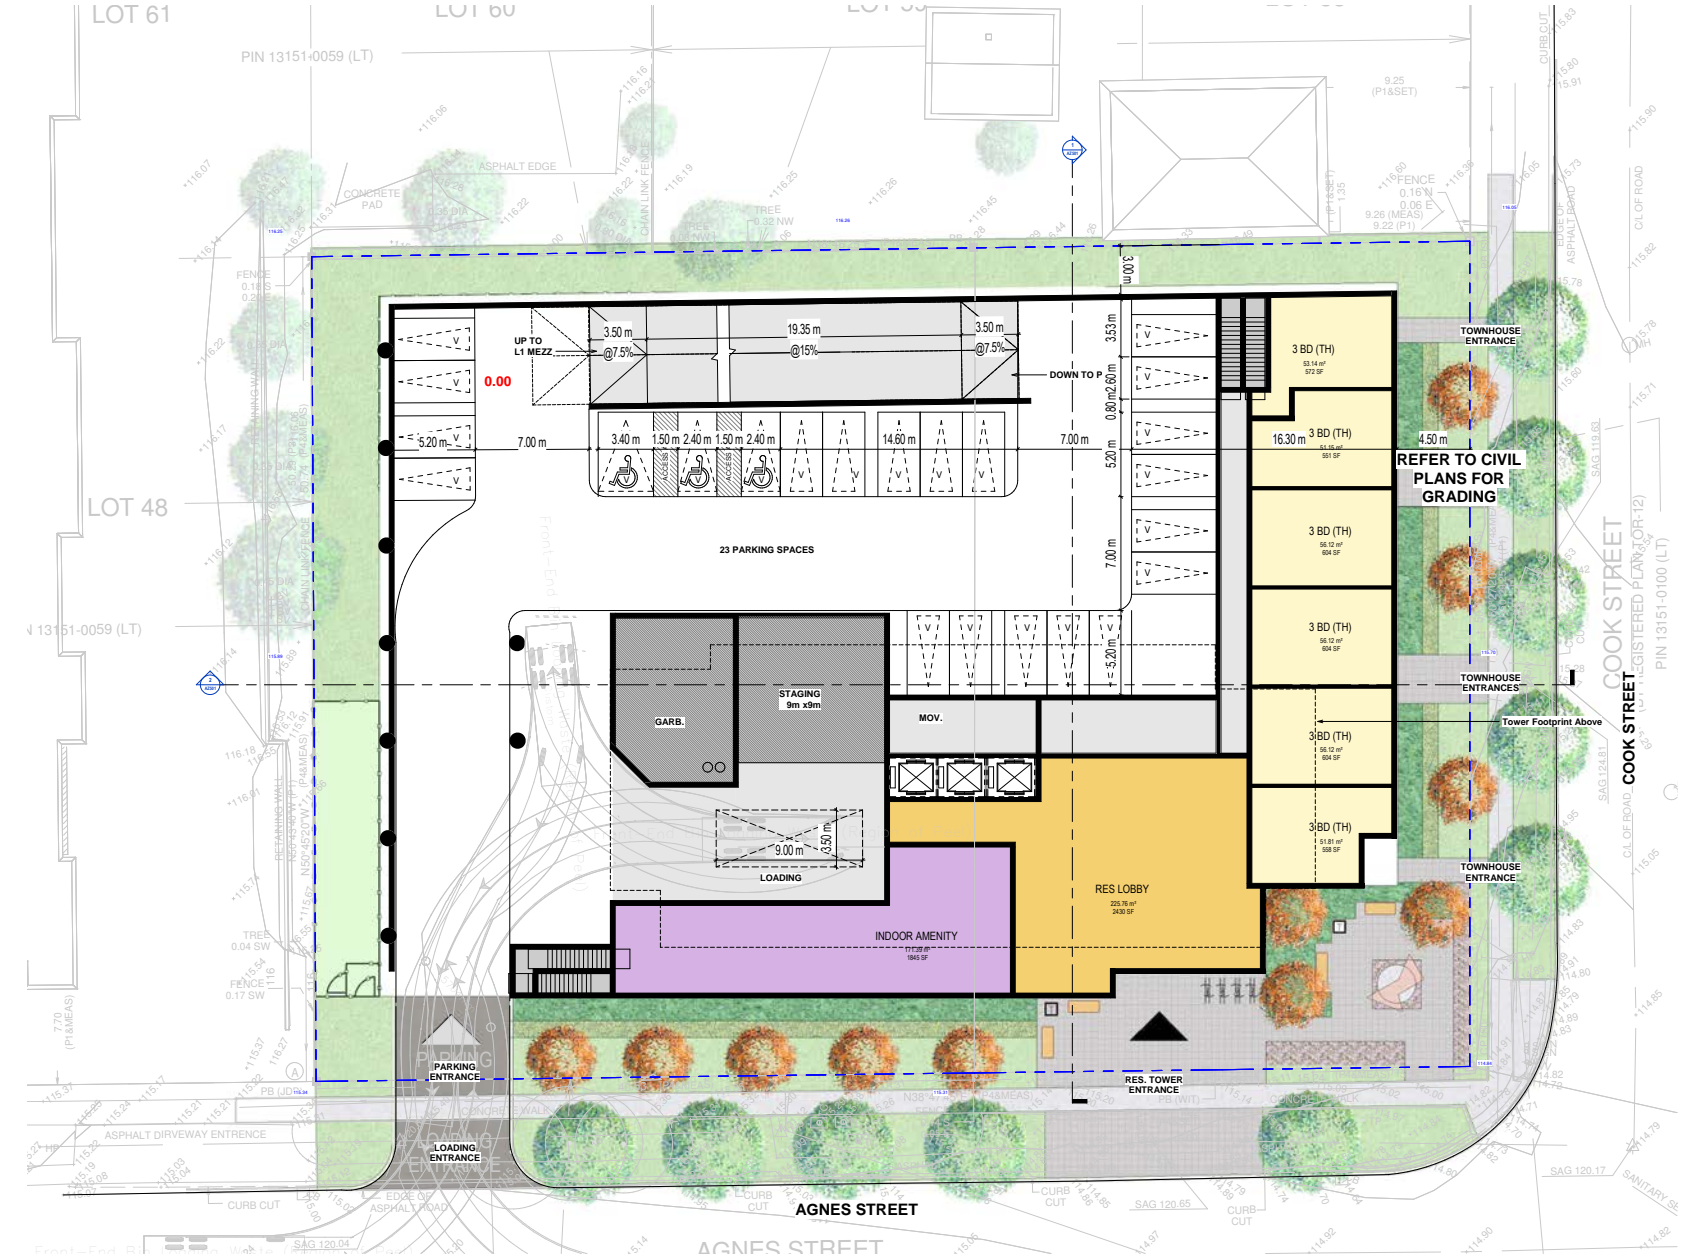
Ground Floor Plan (Prepared by Sweeny & Co Architects Inc.)
